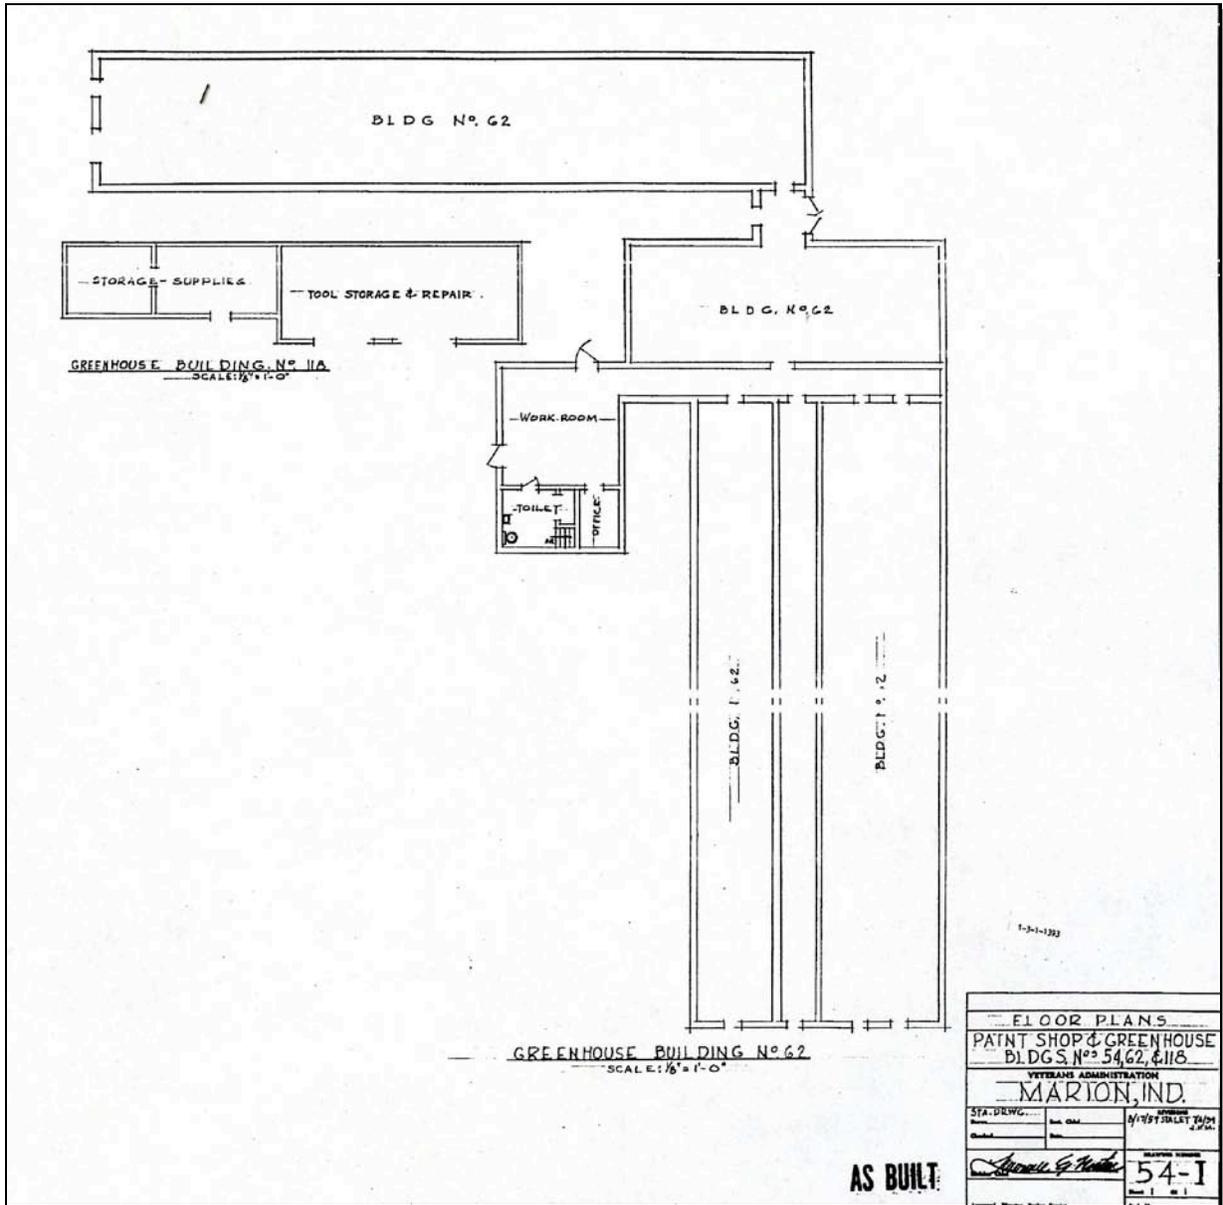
Plan of Building No. 62, Greenhouse, (17 August 1959)
